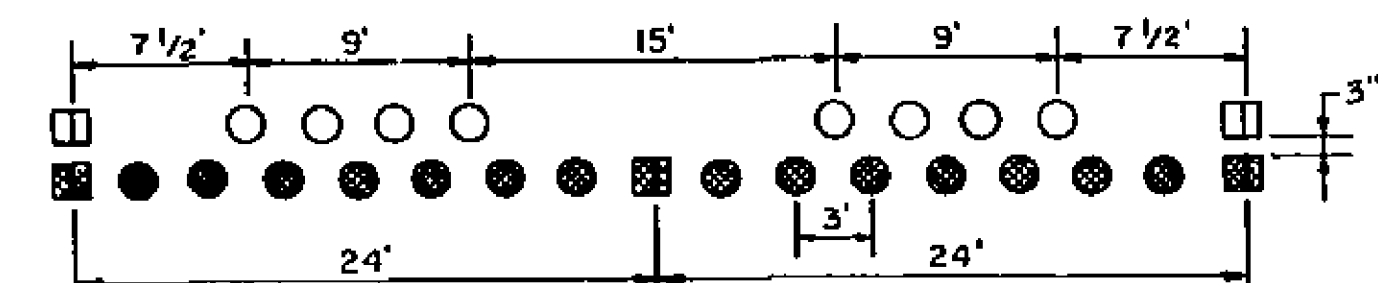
CENTERLINE ON TWO LANE CONVENTIONAL HIGHWAYS
